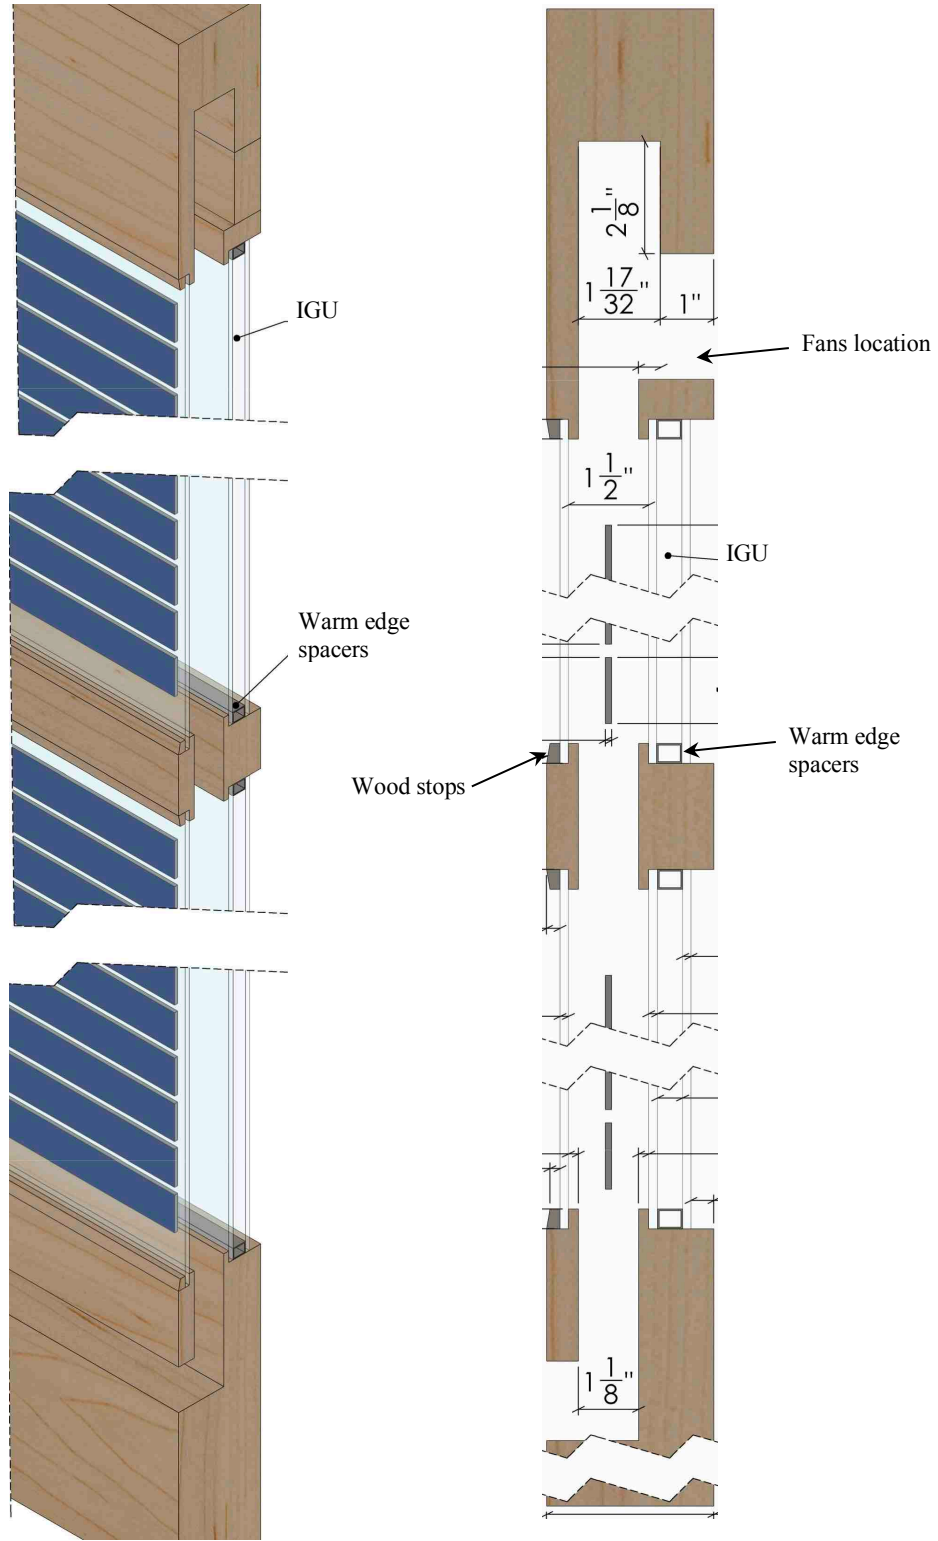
Prototype 2 2D and 3D cross sectional view.
